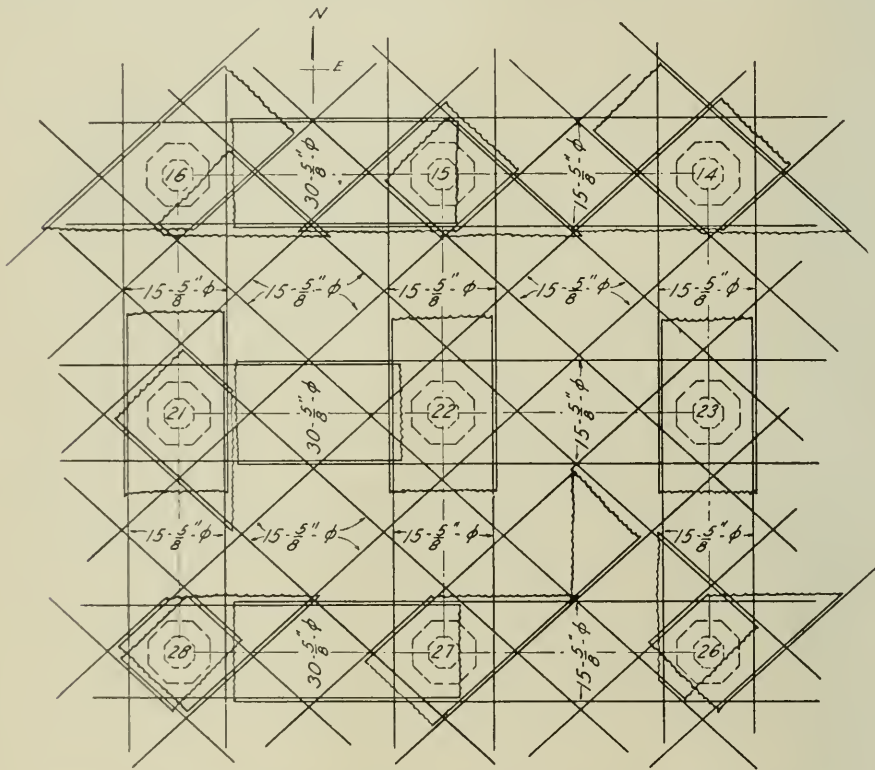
ARRANGEMENT OF REINFORCEMENT IN TEST AREA
